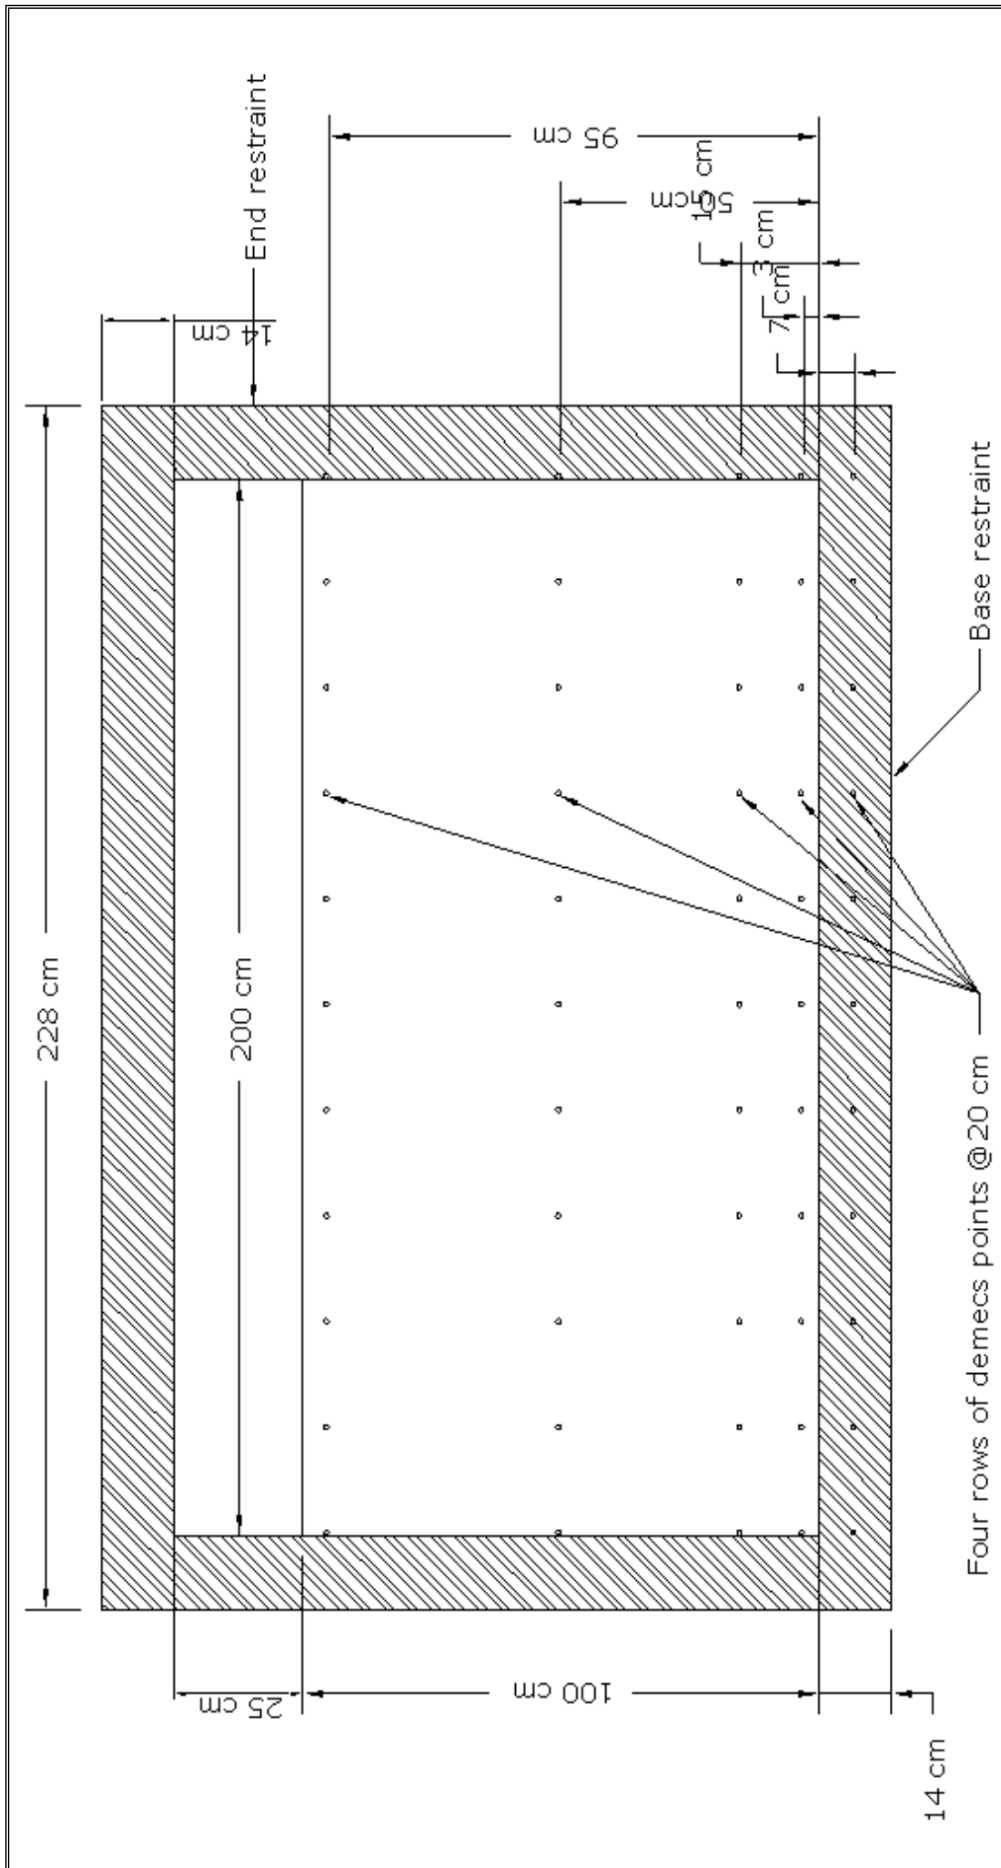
Fixing of demecs on wall (2w) and (2S)
